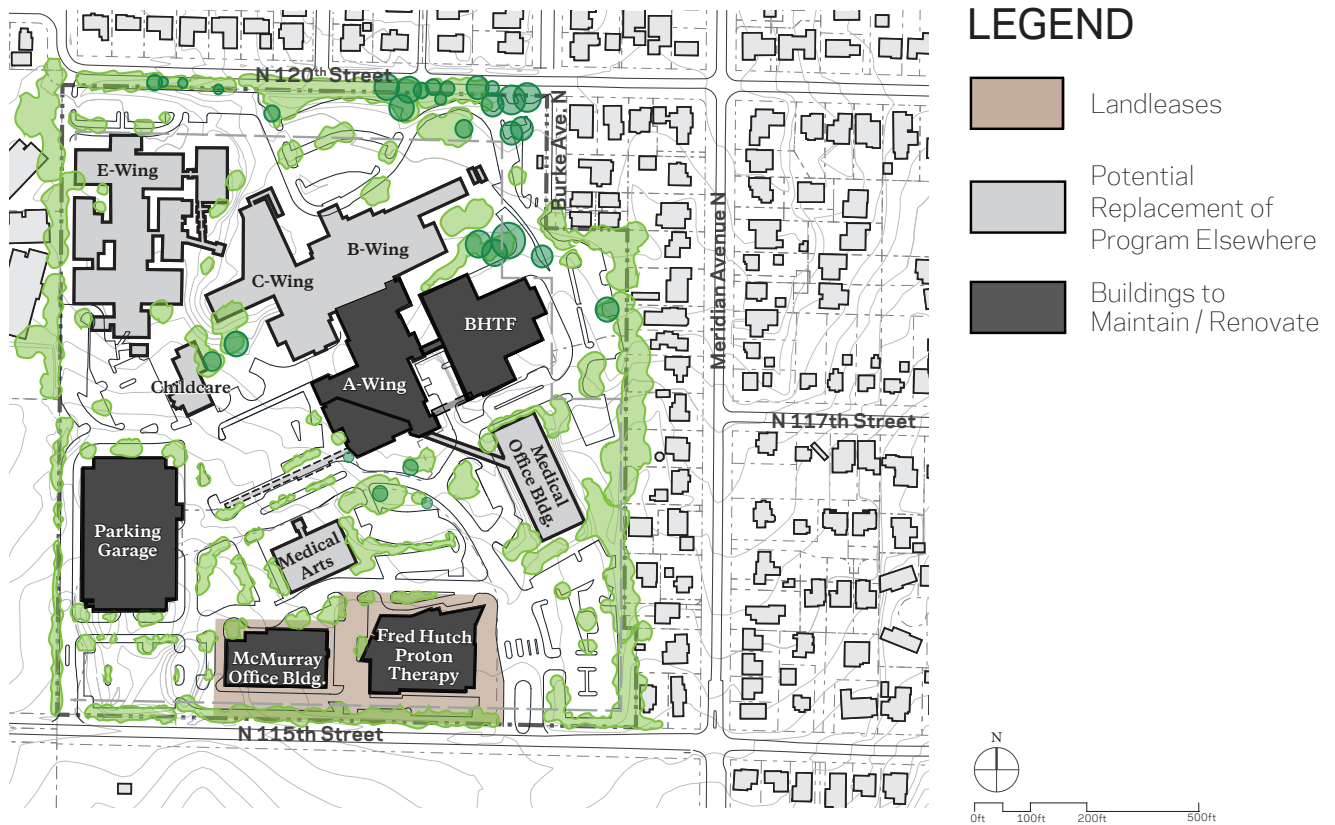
POTENTIAL BUILDING MAINTENANCE AND DEMOLITION DIAGRAM
